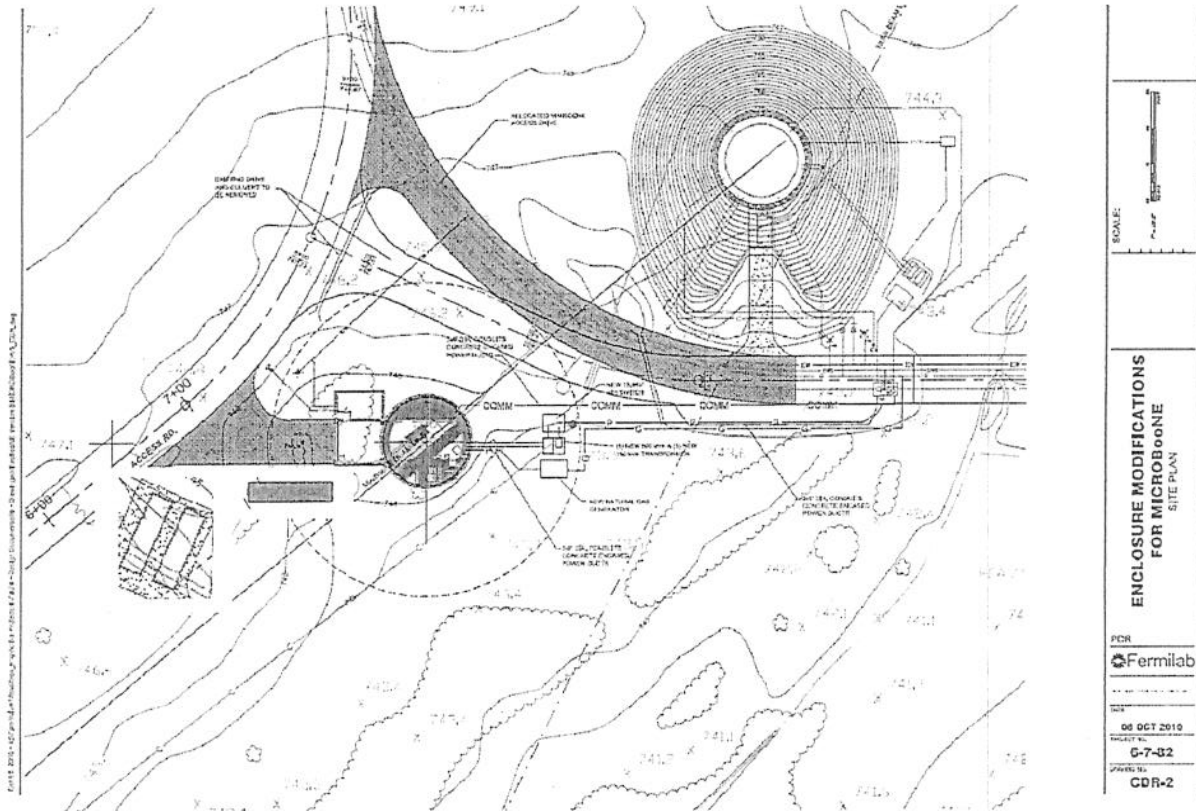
A plan view of the MicroBooNE Facility showing outside storage areas.
